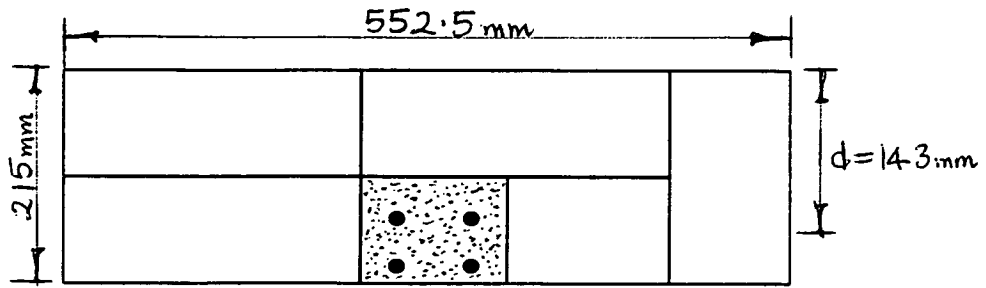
Cross-section of the pocket-type reinforced brickwork beam (B1-B4)
